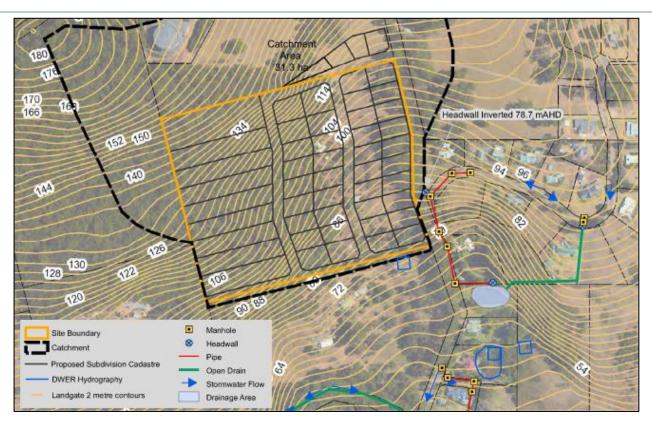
Stormwater Drainage Catchment Plan (Hyd2o)
